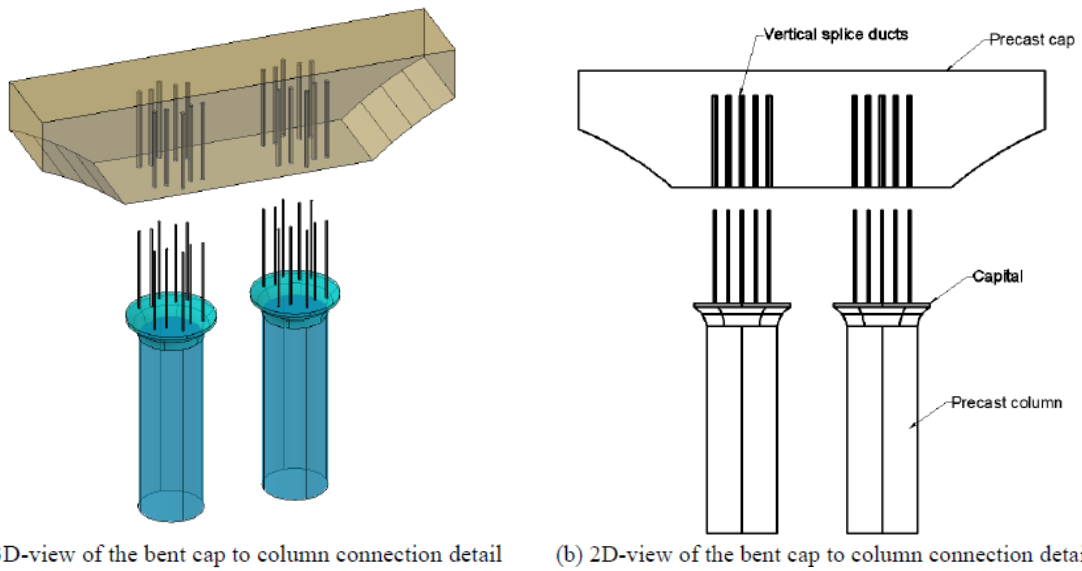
Precast column to bent cap with grouted corrugated duct connection (Aktan and Attanayake 2013)
